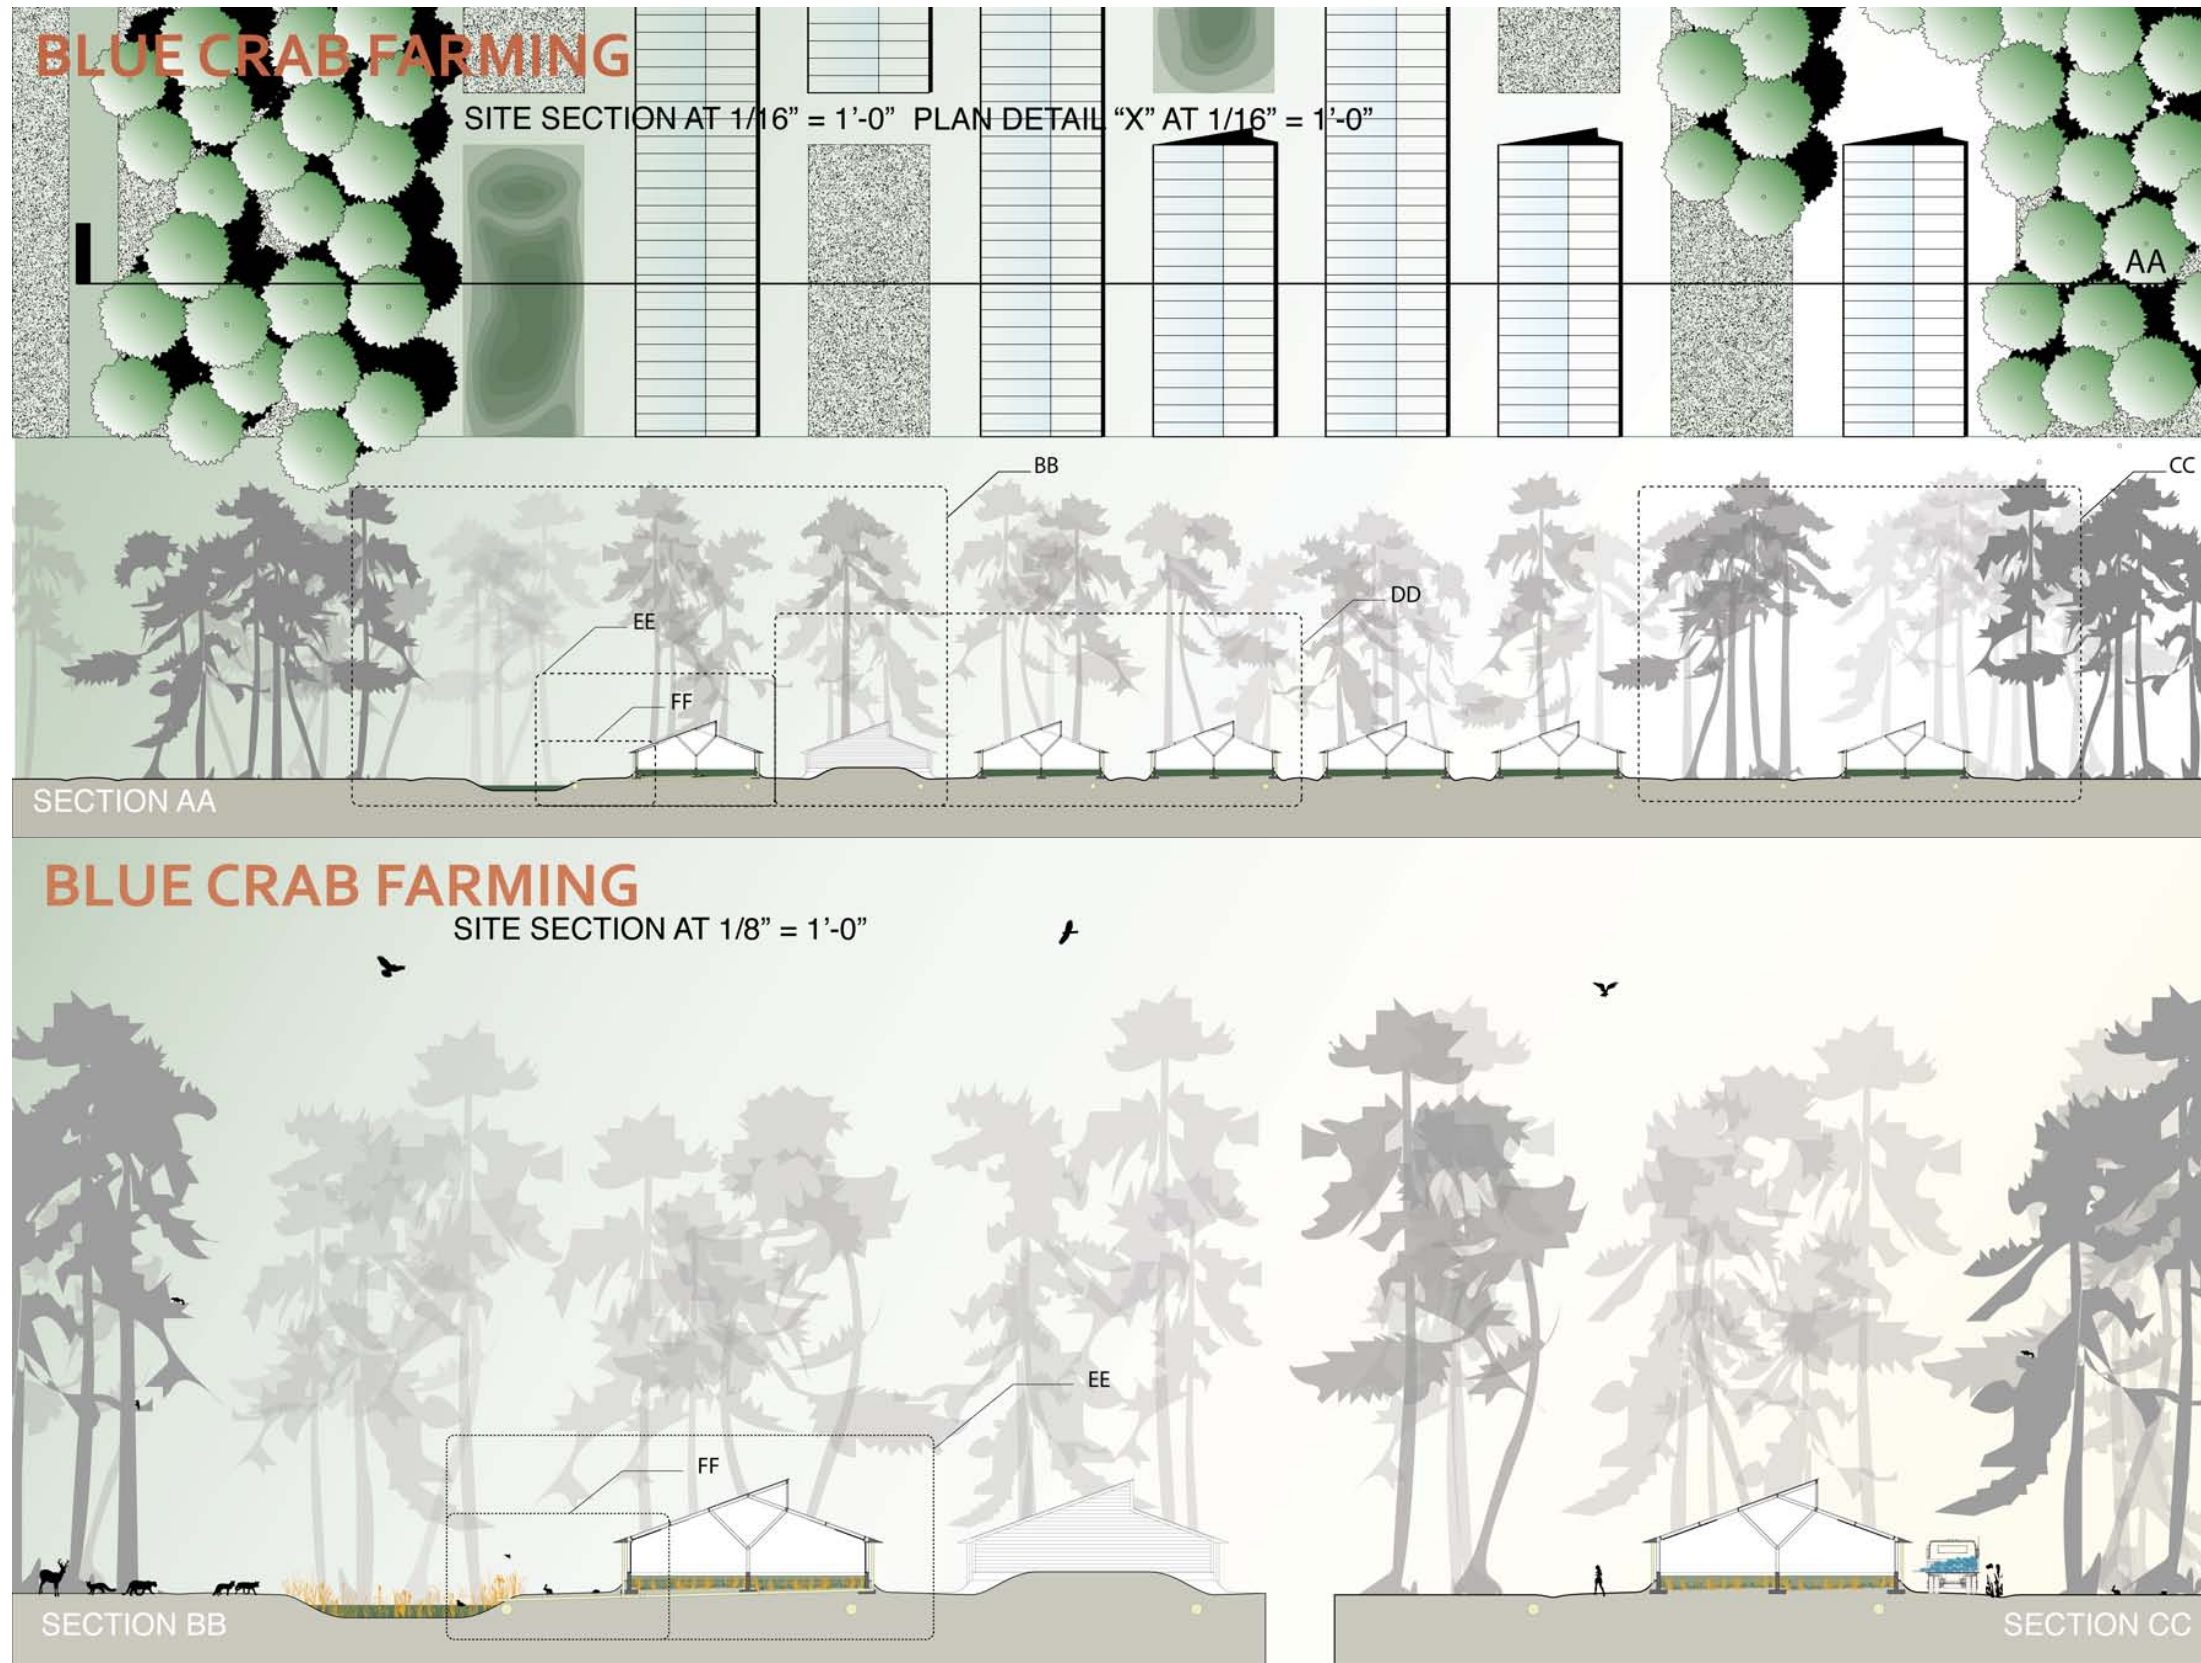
Plan Detail "X", Site Section AA, BB, CC. Author Illustration.
